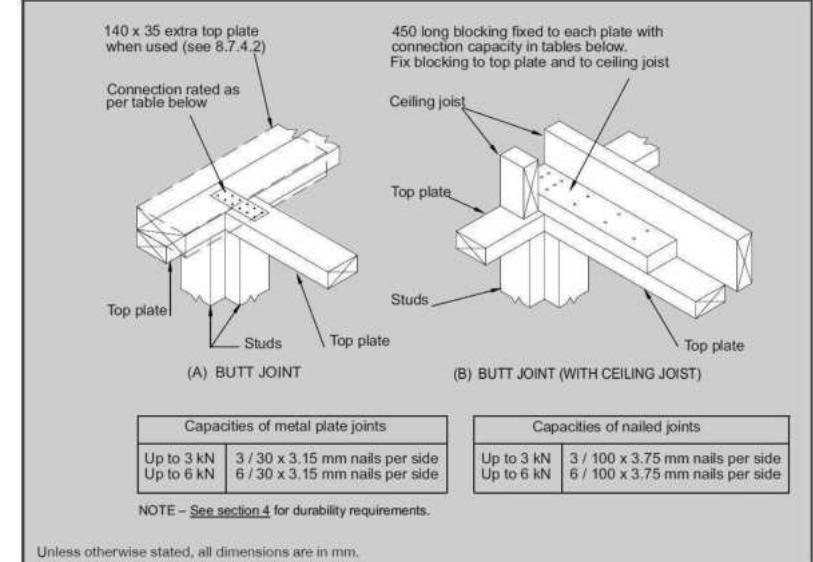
Connecting top plates to external walls at right angles – Walls containing bracing (see 8.7.3.4)
